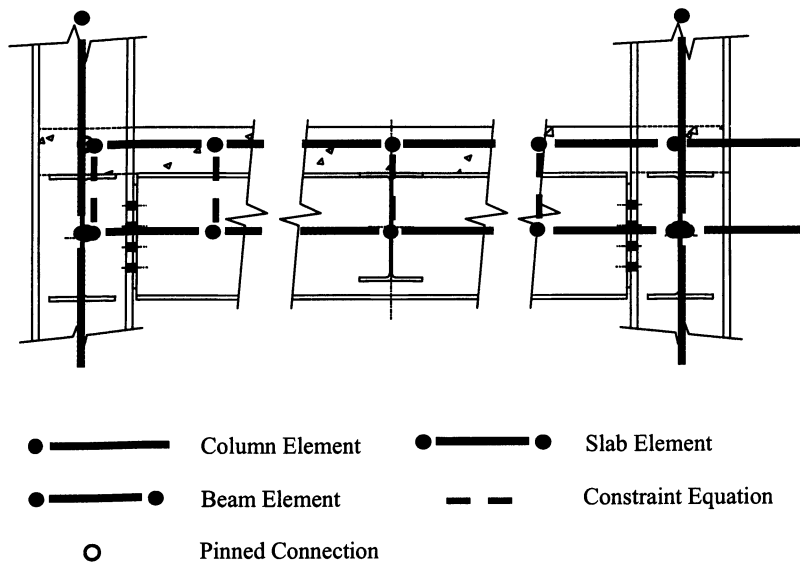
Elevation through typical composite frame showing meshing details
